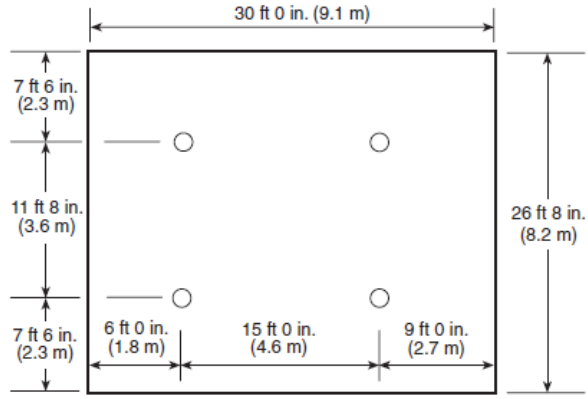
(d) Small Room Provision — Four Sprinklers.
